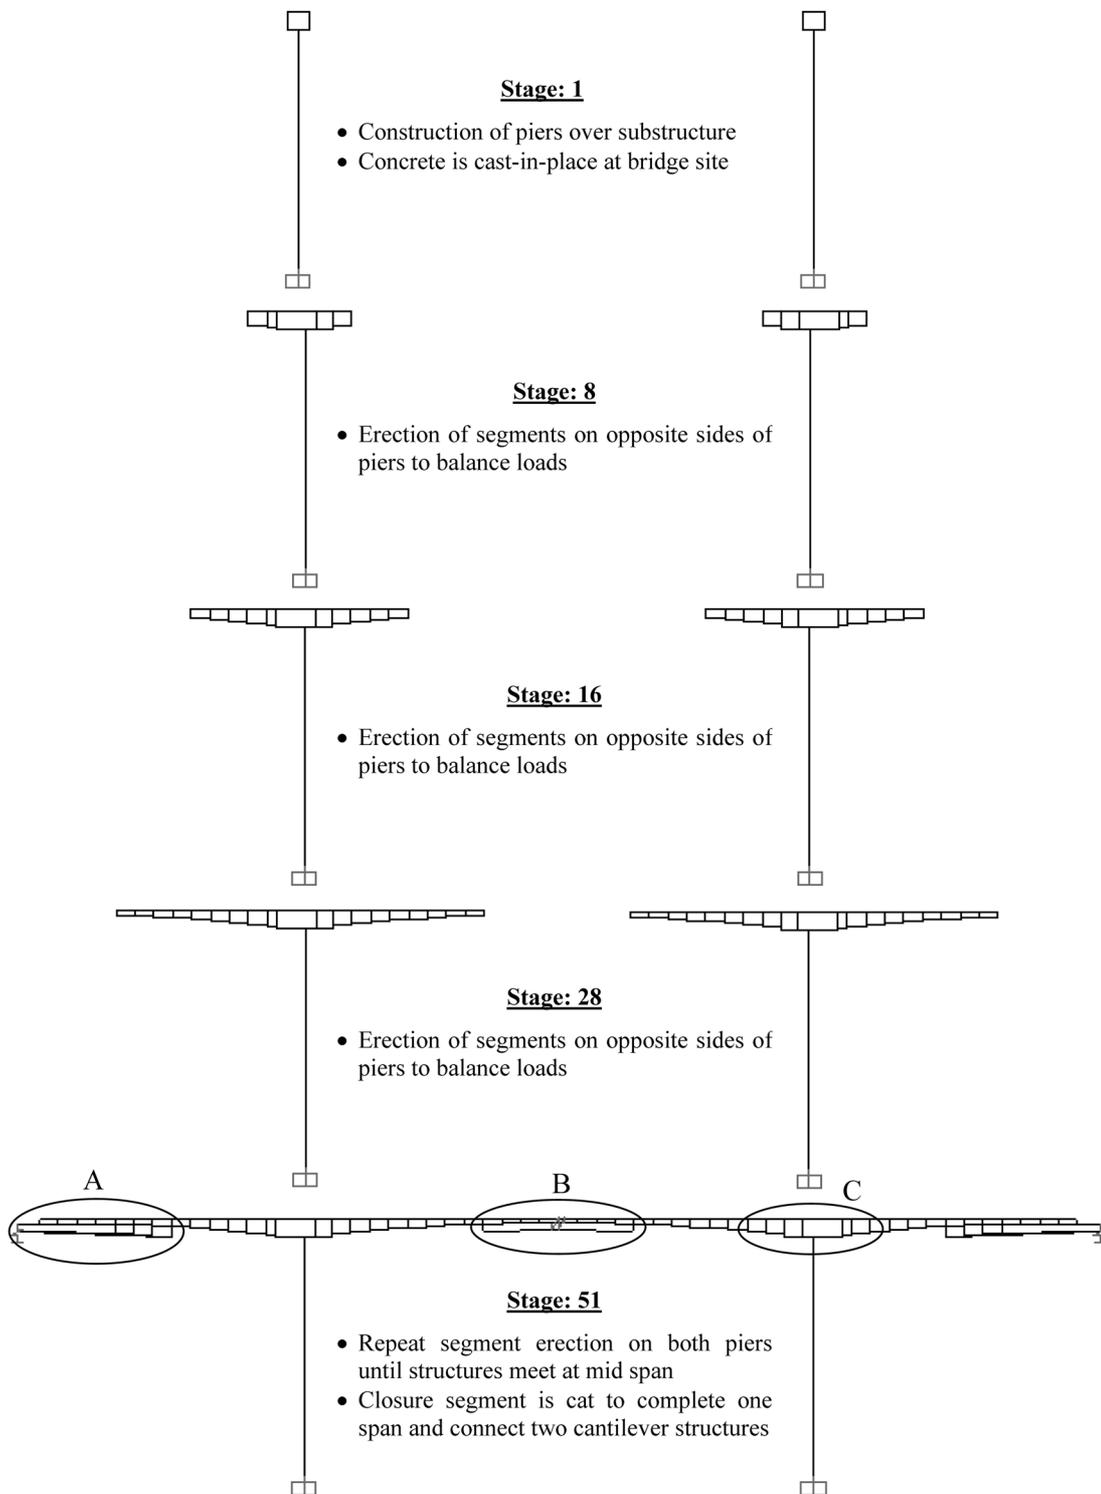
Some construction stages of Kömürhan Highway Bridge
